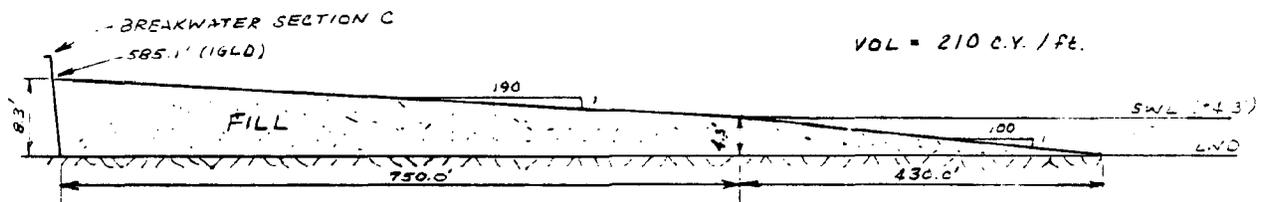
Proposed engineering design cross section of headland park through Sections A, B, and C, see Figure 3.1-8.
